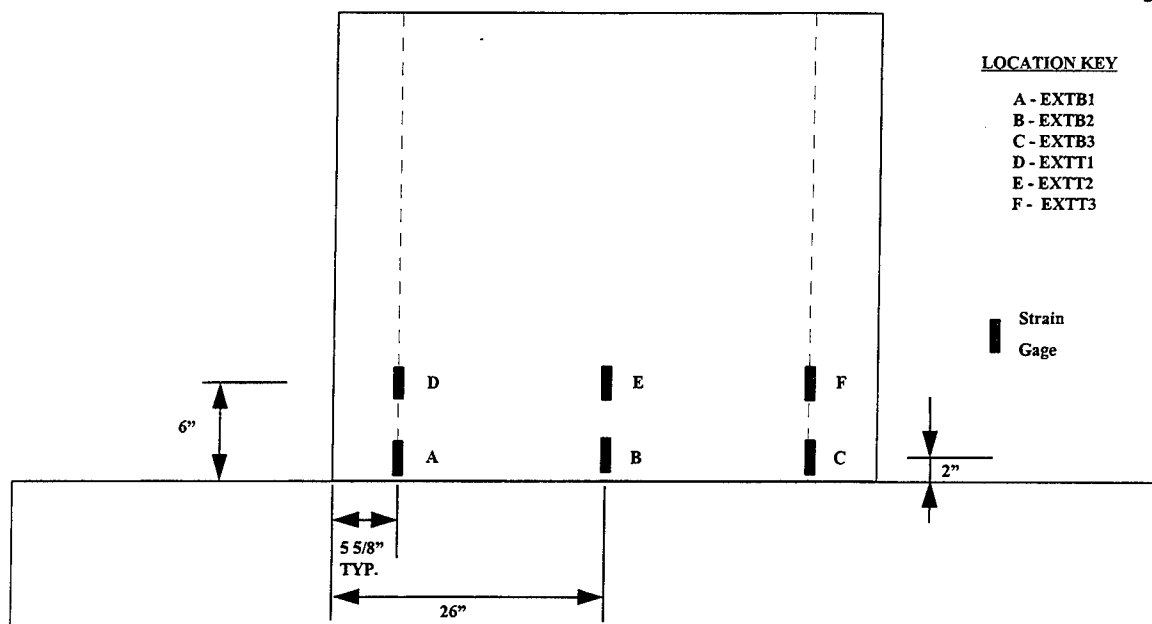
Location of strain gages mounted on exterior of wall, on west (compression) side of ITS-1 structure.
